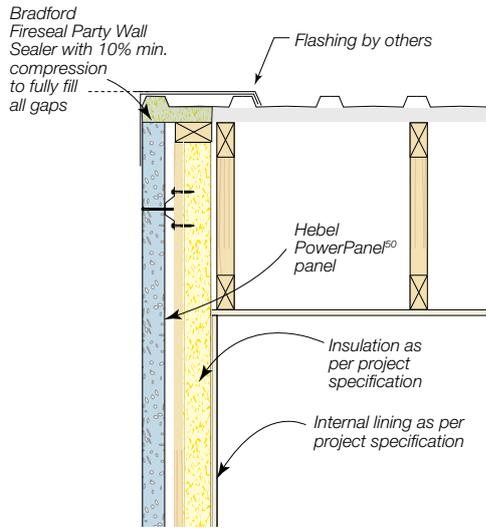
Typical Dual Zero Boundary roof eave detail
